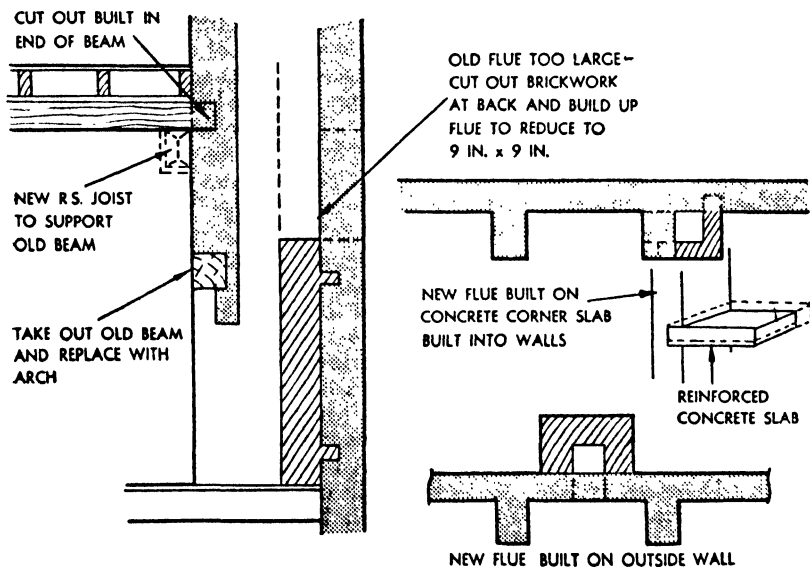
(Left) Section showing how to reduce size of old flue and how to remove old timber beams built into flue wall. (Right) Two plans showing methods of building a new flue to replace an old one which has become faulty.
